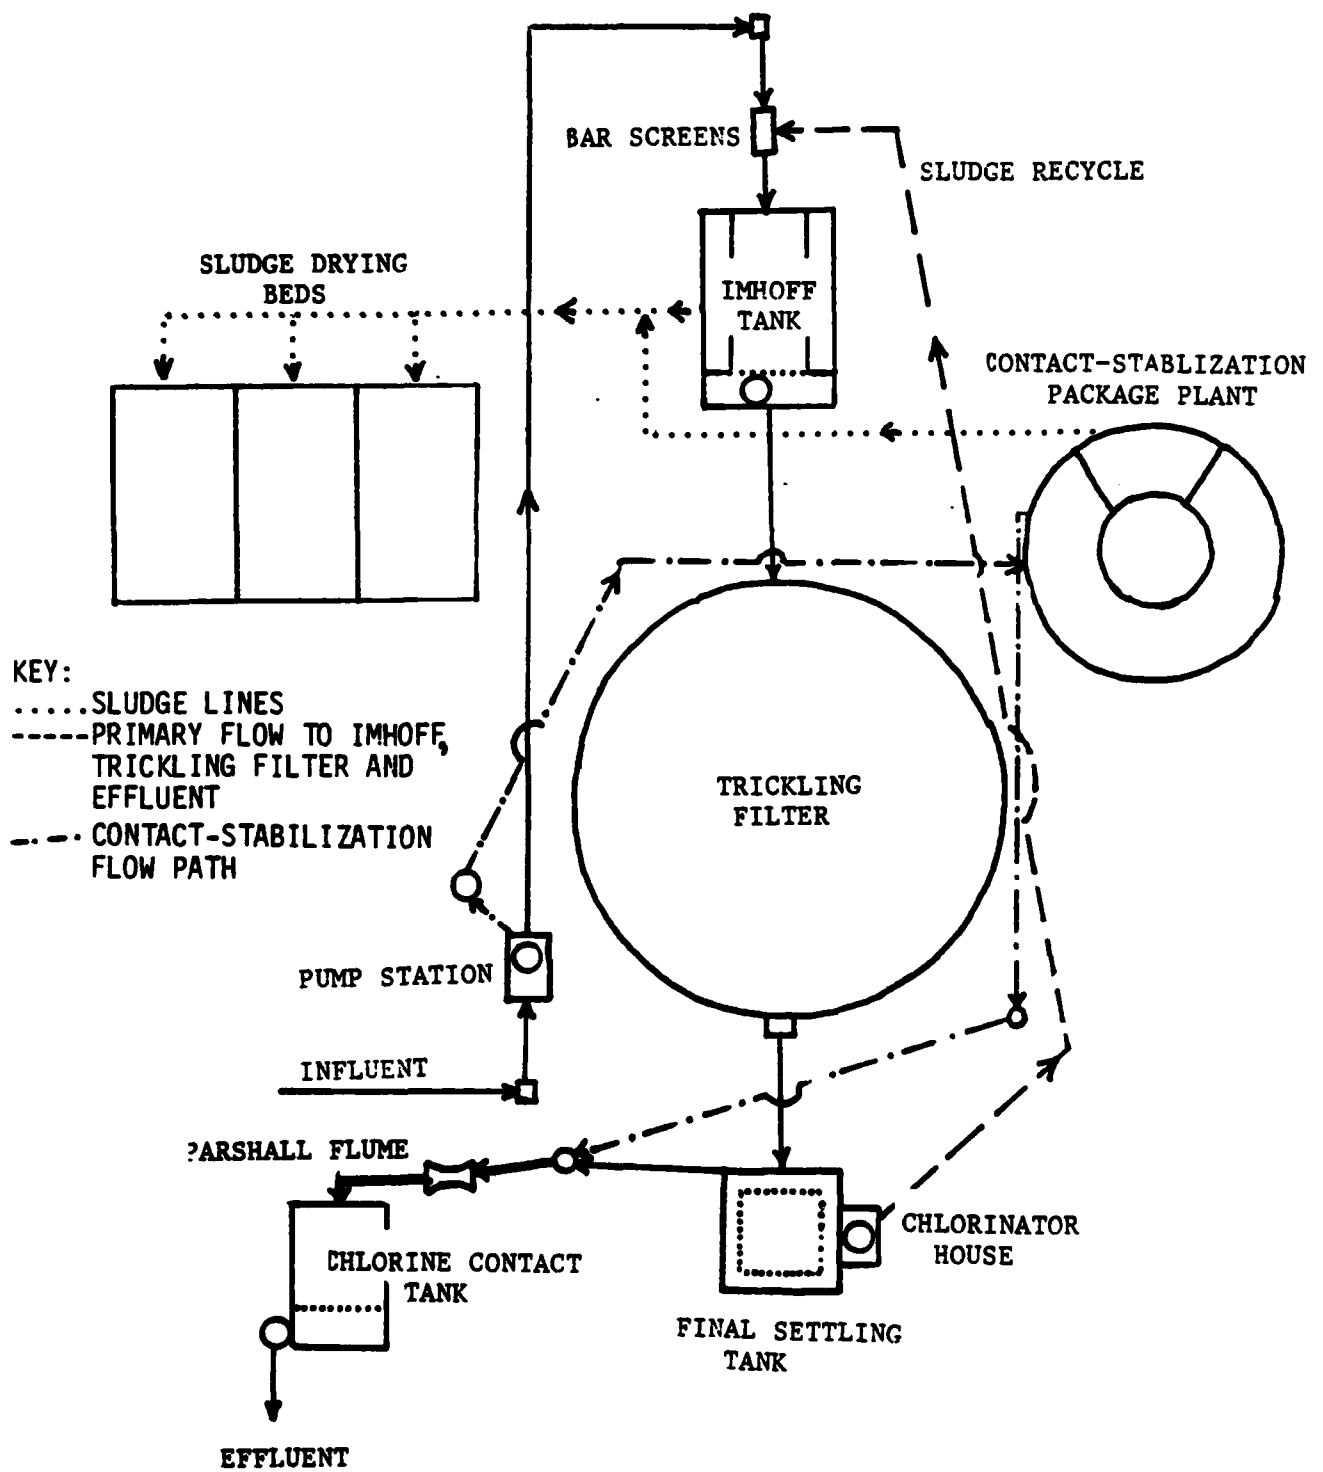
Plan View, Medina Annex Wastewater Treatment Plant, February 1983
